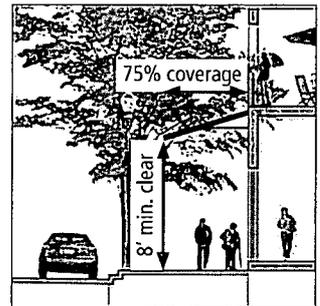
Awning section with minimum clear height above sidewalk & desired coverage.
